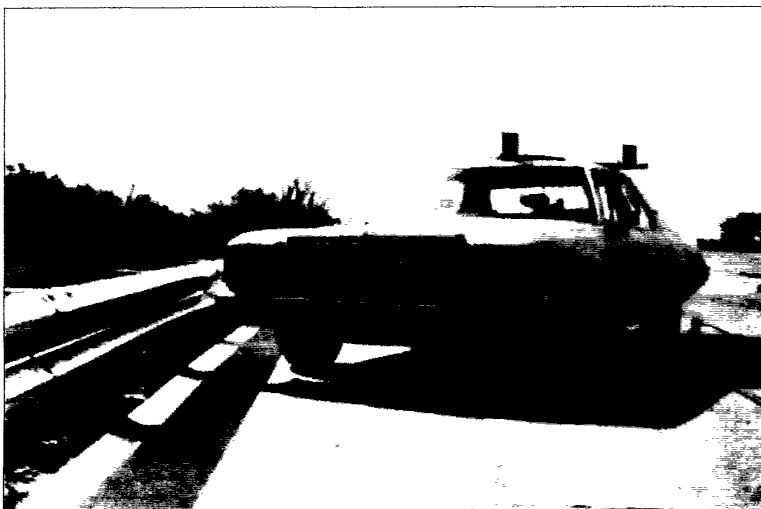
Side-Mounted Rectangular Tube Bridge Railing
